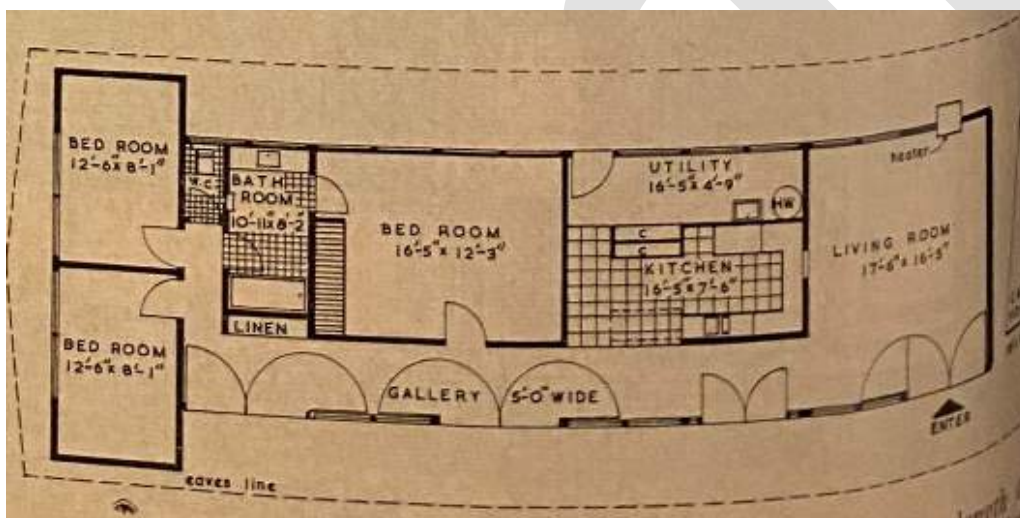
Site plan showing the layout of the house, 1963 (Source: *Australian House & Garden*, August 1963, p 42)
